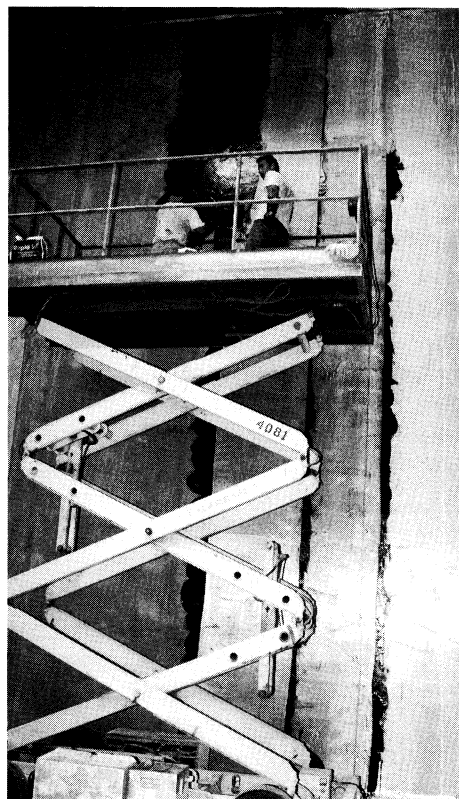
Application of Composite Fabrics to both faces of Tilt-Up Walls (Courtesy of External Reinforcement Inc.)
